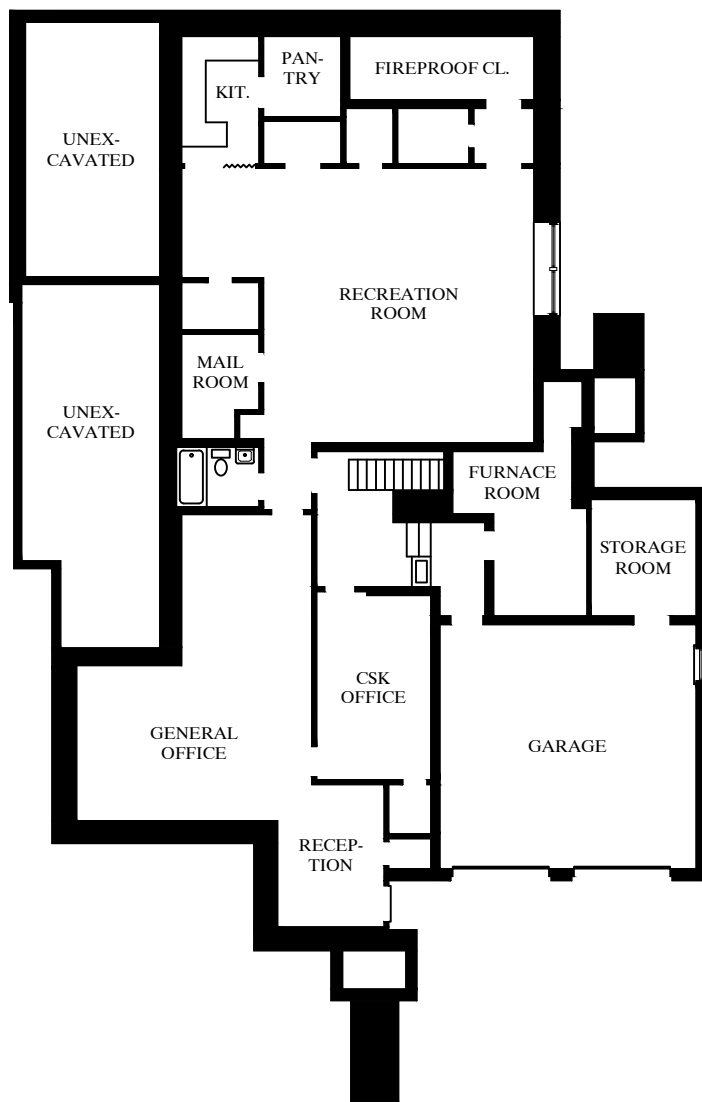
A3 Alterations & Additions, Basement Floor Plan (Plans, Details, Sections & Elevations) 1 of 1, 5/1968, Joseph W Robinson, AIA Architect. (Source: MALU Archives.)
